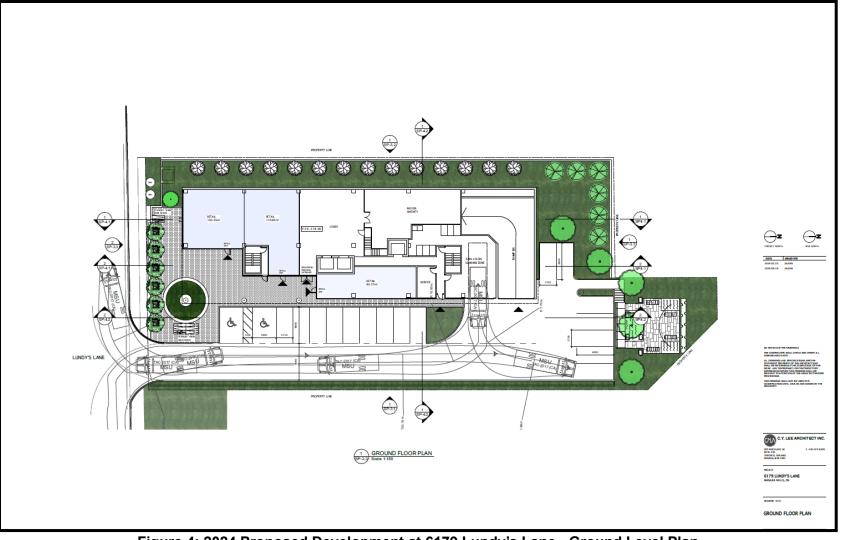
2024 Proposed Development at 6179 Lundy's Lane - Ground Level Plan (CY Lee Architects Ltd. 2024a)
